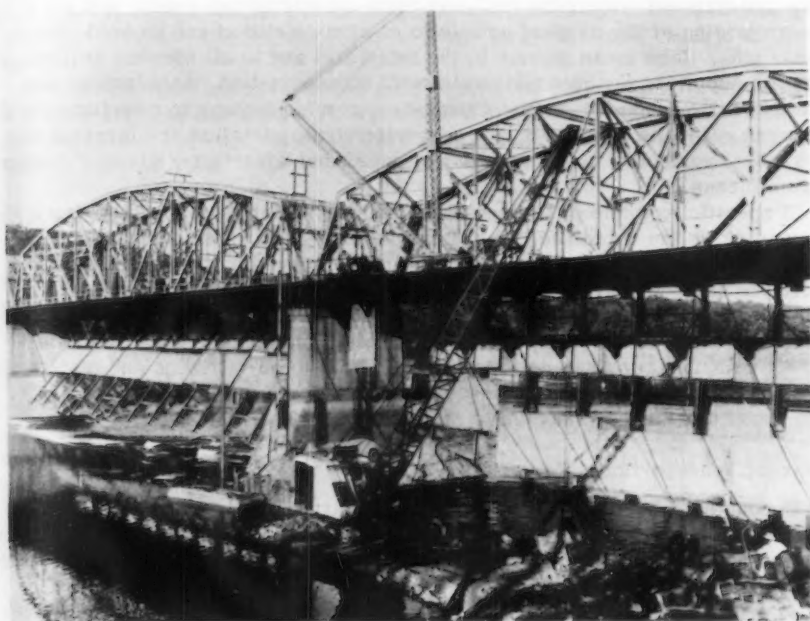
Reconstruction Work at Lock 9, Erie Canal. Building the Upstream Steel Sheet Pile - Earth Cofferdam Prior to Replacement of Failed Apron and Sill in South Span of Dam. Note Partially Raised Gate Uprights in Middle Span, and the Fully Raised Upper and Lower Gate Pans on Their Respective Uprights.
